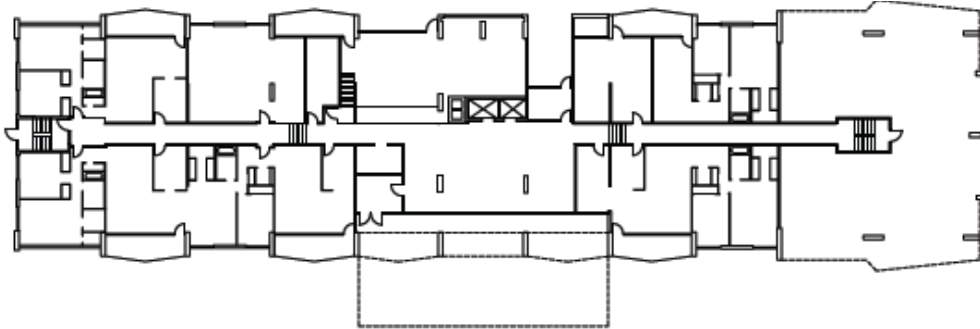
Ground Floor Plan (Kesik & Saleff, 2009)
